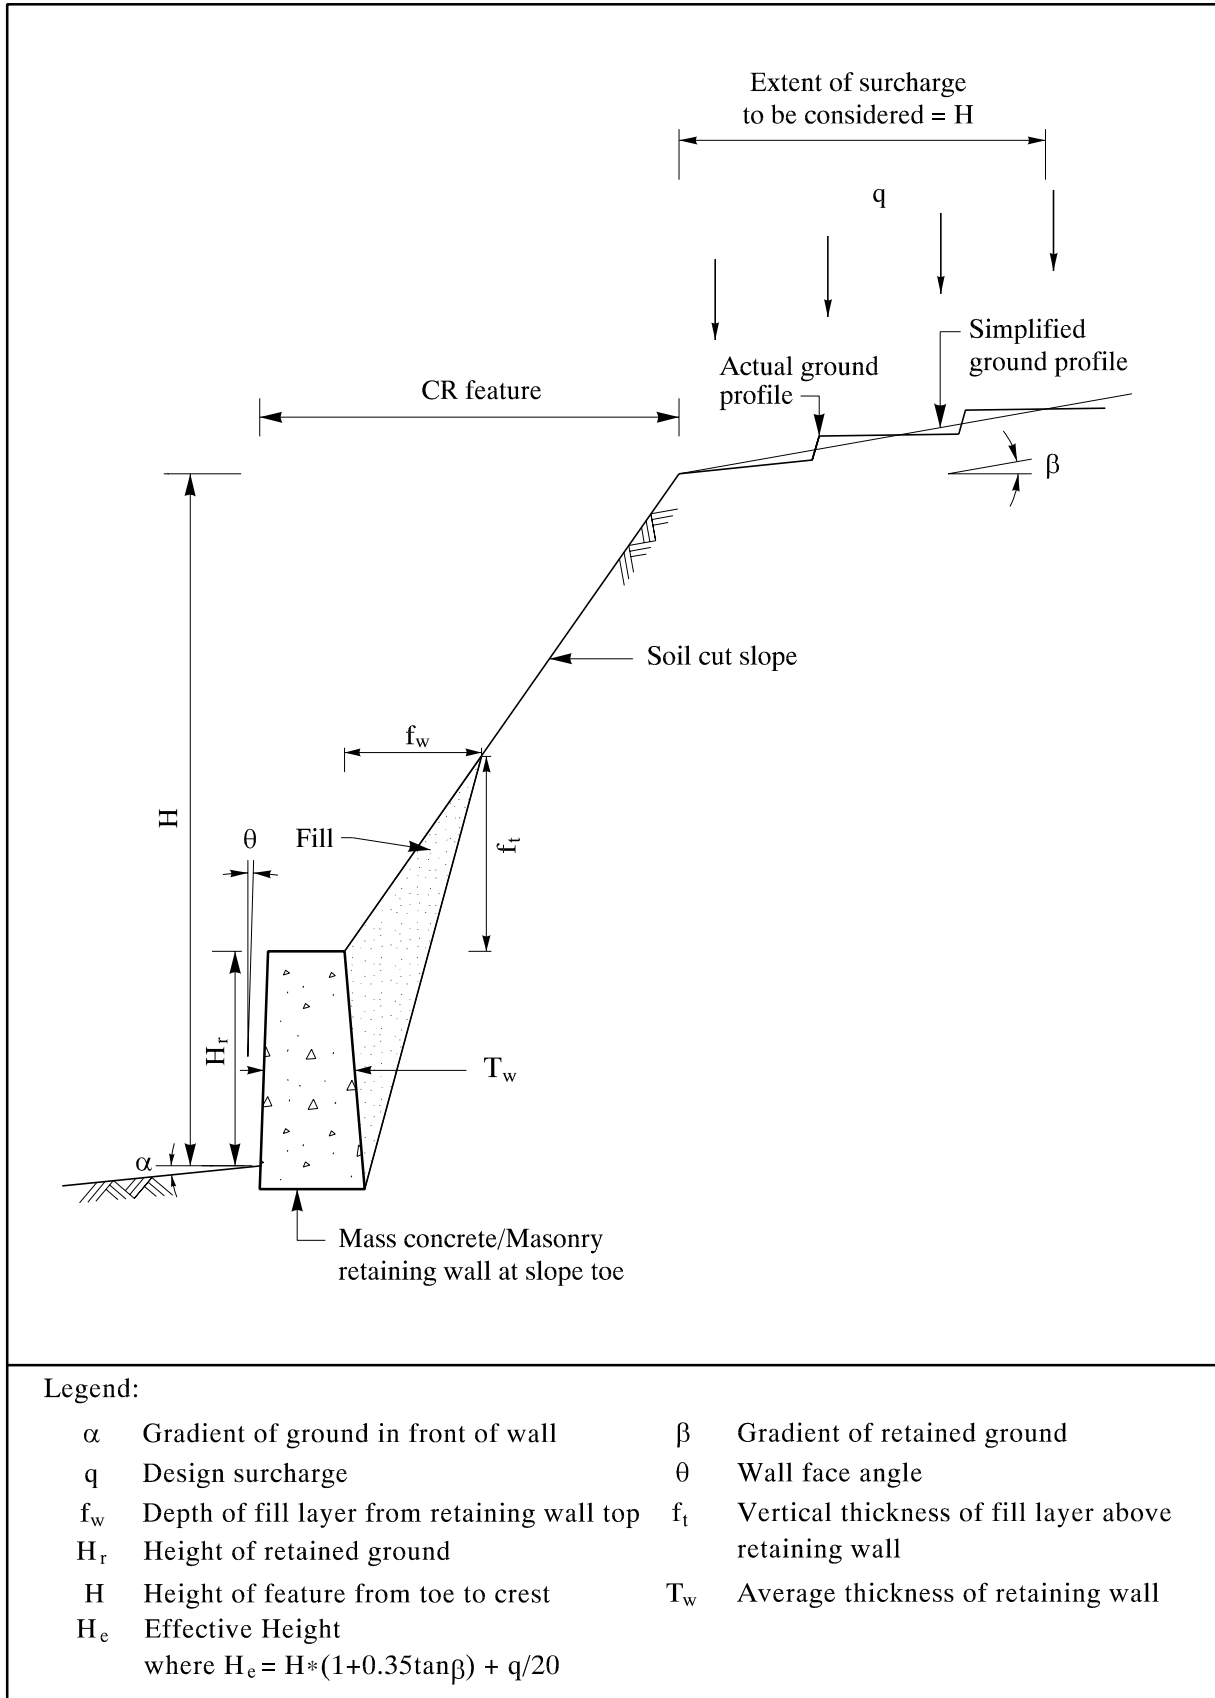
Simplified Geometry of CR Feature with a Mass Concrete/Masonry Retaining Wall and the Adjacent Ground
